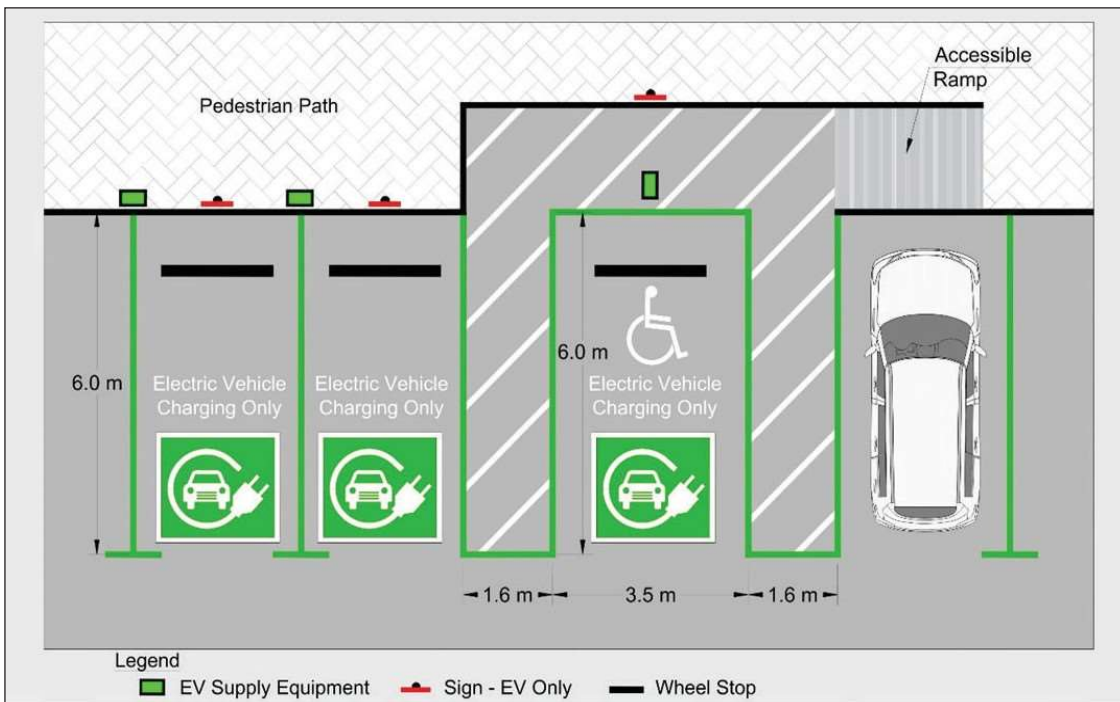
Typical Electric Vehicle Perpendicular Parking Layout
